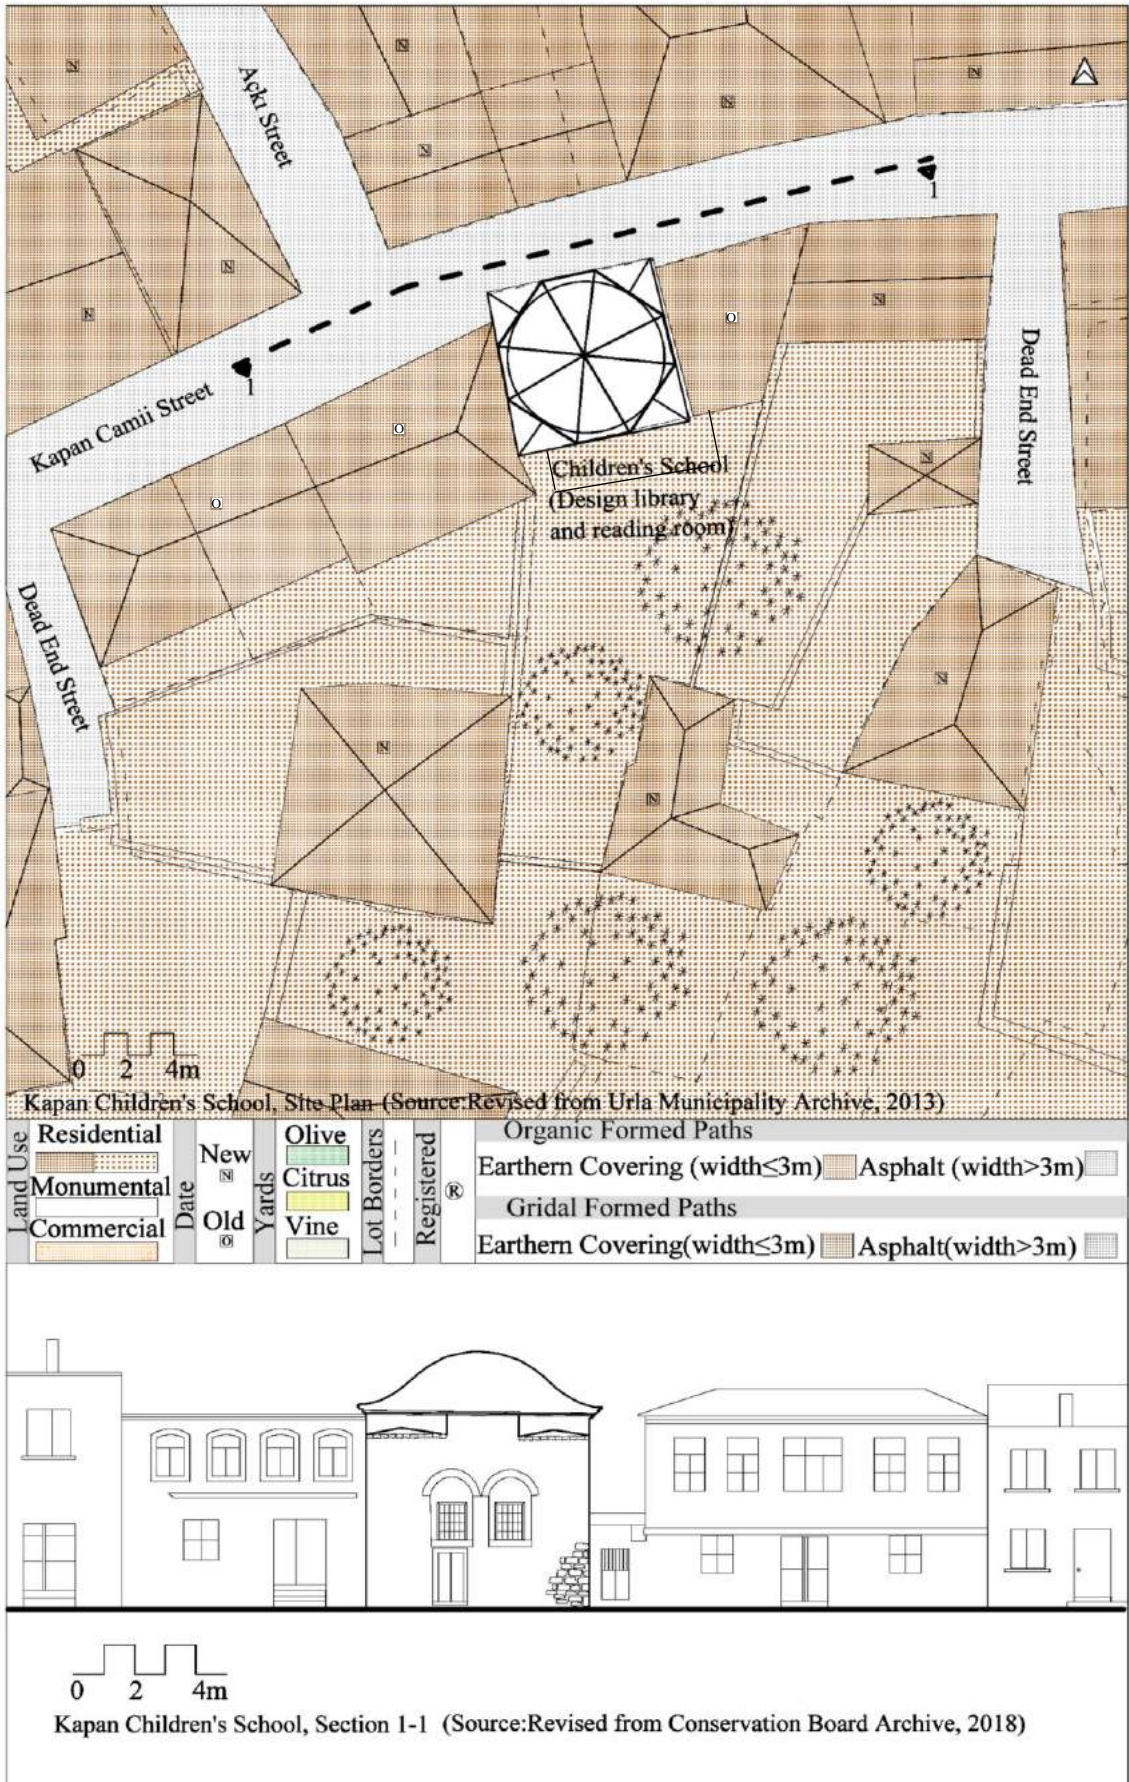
Site plan and silhouette section, Kapan Children's school
